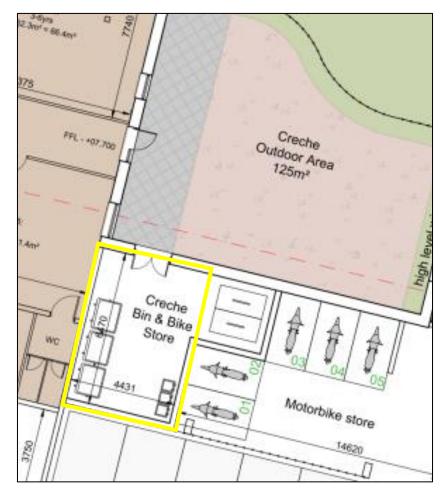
Internal Layout of Creche Waste Storage Area (Yellow)
